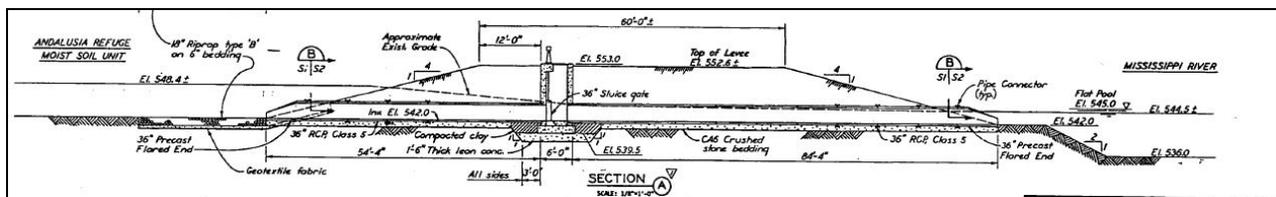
Typical Levee Design Section (Sheet C-15, O&M Manual)
